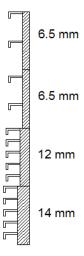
Wall of Tank A with changed thicknesses for the bottom 2 courses and provided with stiffeners [Note: This is a concept calculation and presents rough approximations]
